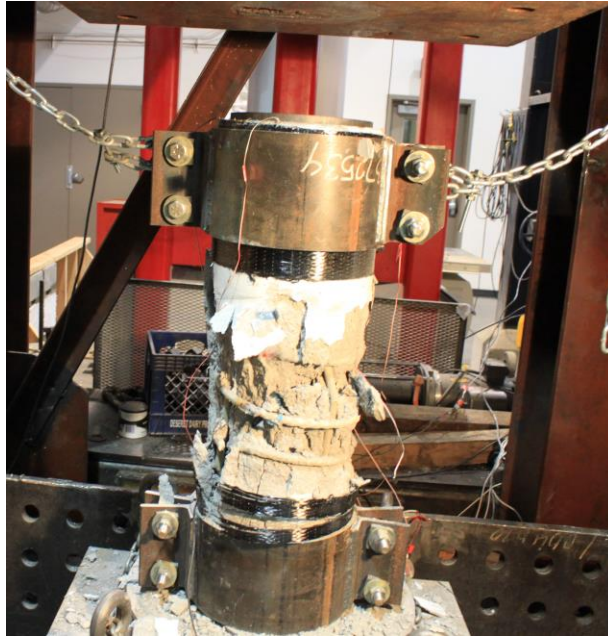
Concrete prism reinforced with GFRP spiral #3@3 at failure.
